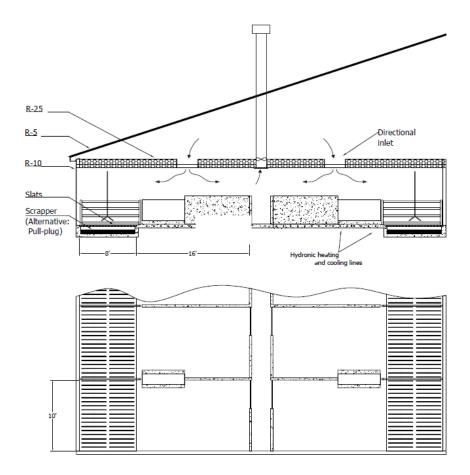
Half section and plan view of GPB A and B, partial slat barns.
